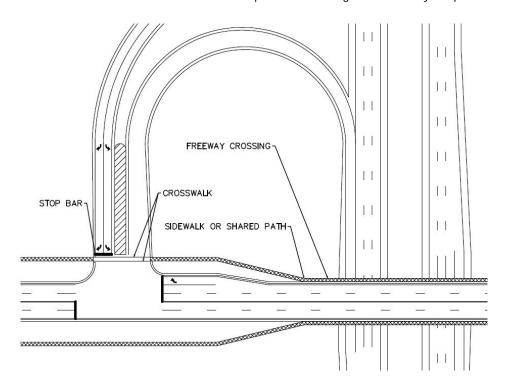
Added Sidewalk or Shared Path at Crossing with Freeway Ramp
